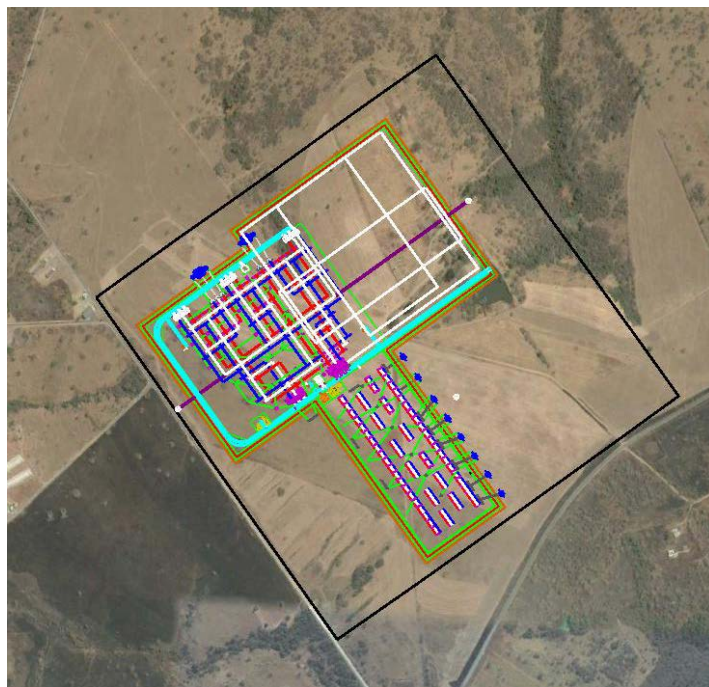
Layout 2: 400 kV yard parallel to the road and space for future lines on the north-east
